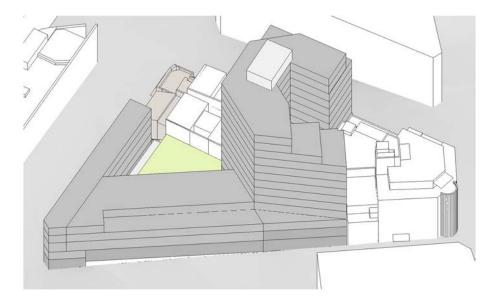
aerial view from west of alternative mixed use scheme at 13a-29 Union Street
